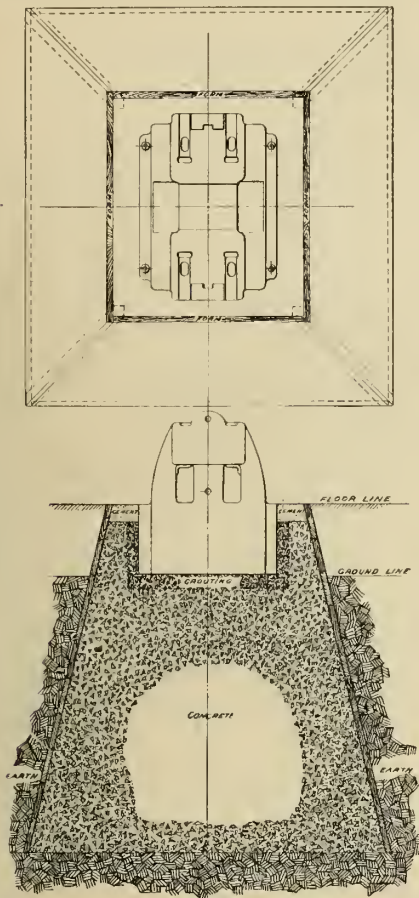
Plan and Sectional Elevation of a Solid Concrete Drop Hammer Foundation.
